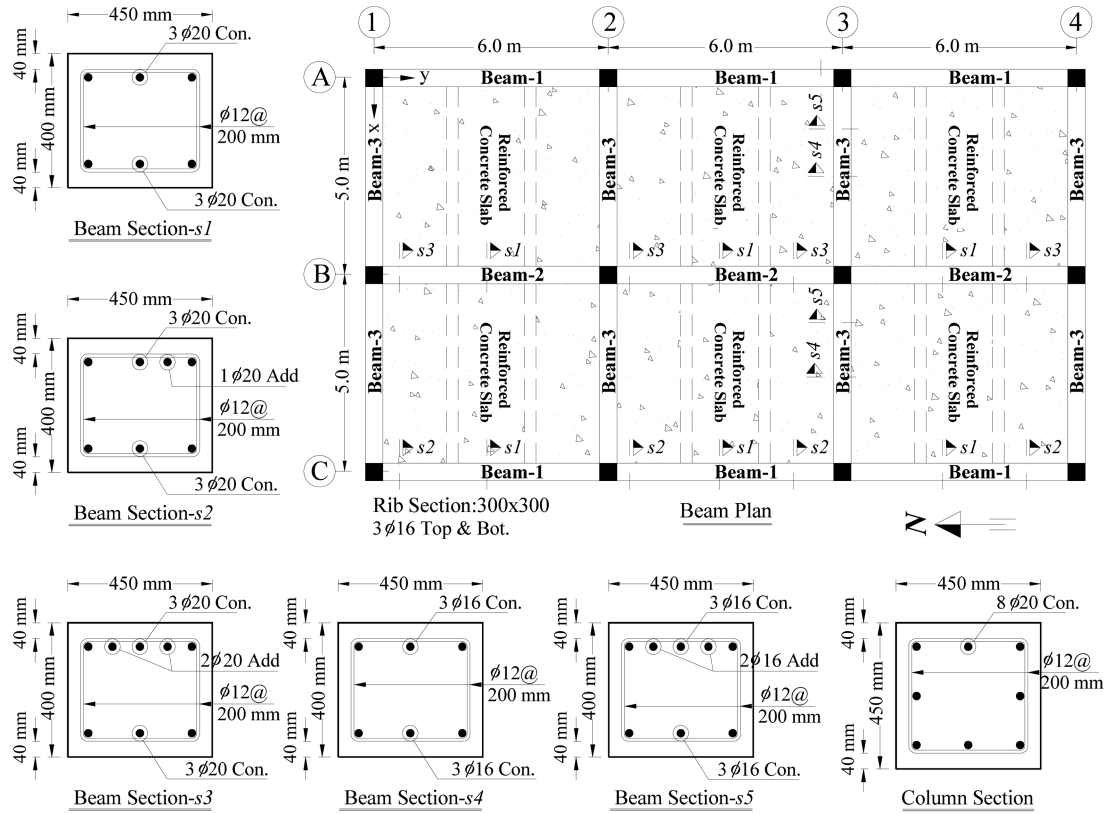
Plan of the 6-storey building and the sections reinforcing details
